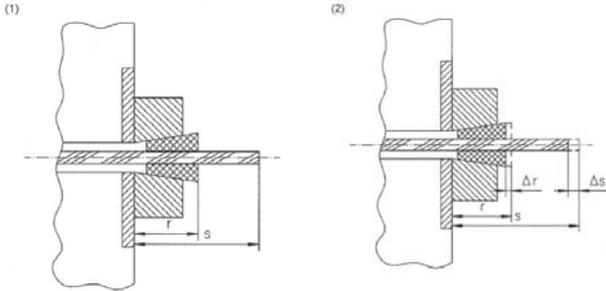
Slides in the anchorage: a) anchorage before prestressing, b) anchorage after prestressing
